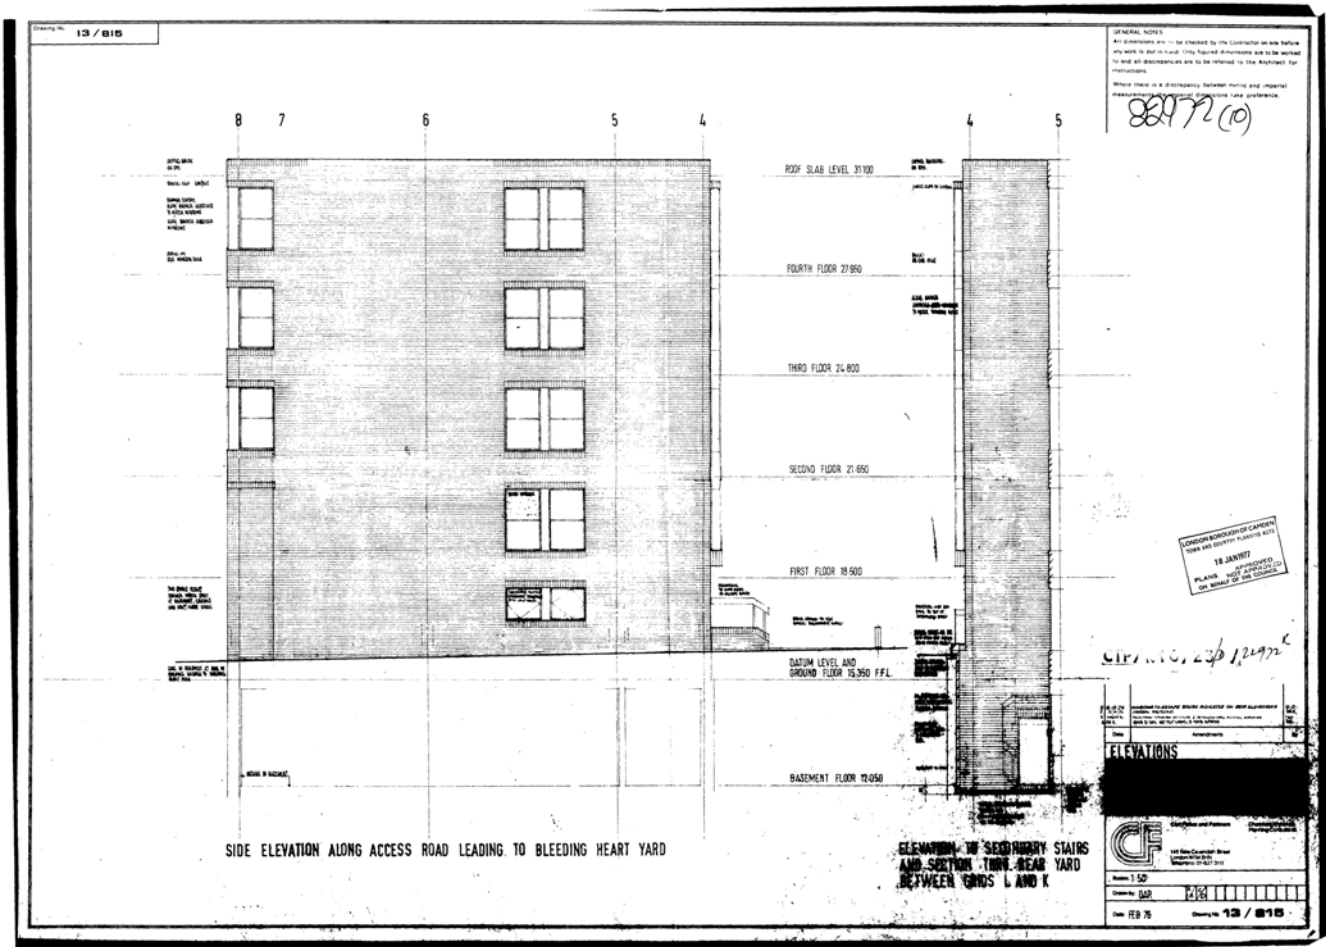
Carl Fisher and Partners, West Elevation, 1976.
